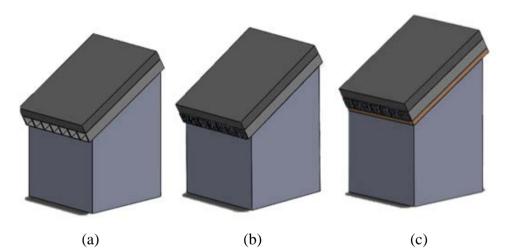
Roof Models in Solidworks (a) Roof Design IV (b) Roof Design V (c) Roof Design VI.
